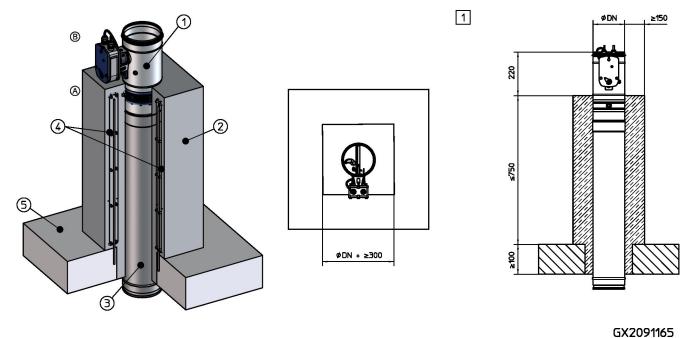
Mortar-based installation with concrete base into a solid ceiling slab, up to El 120 S
